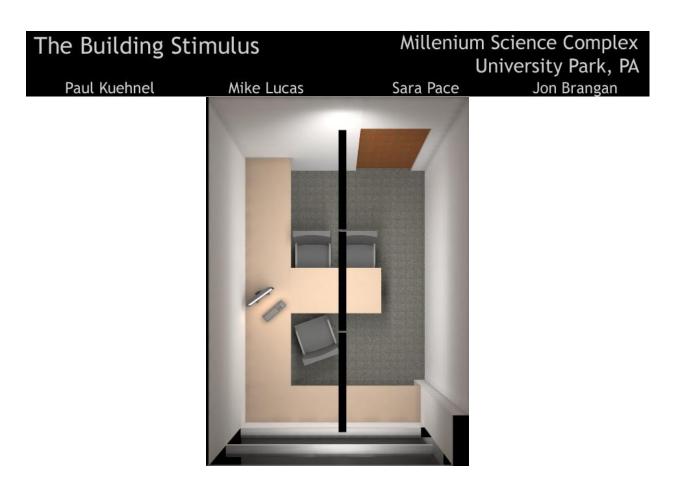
Typical Office - Perspective Top View (All Luminaires On).
